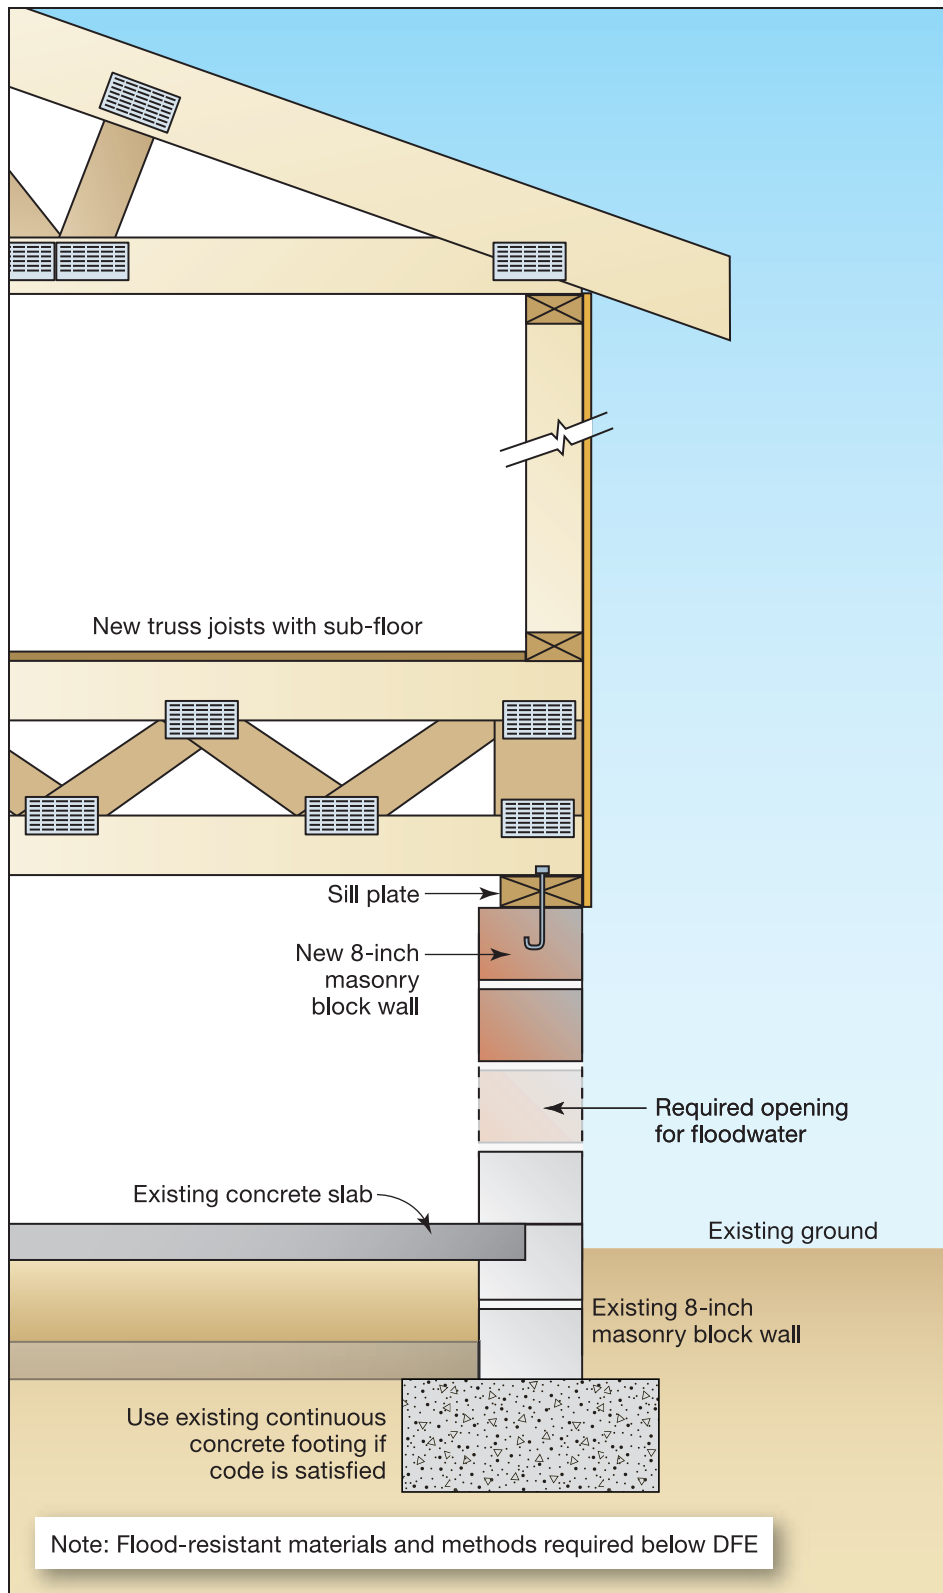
E-20. Cross-section of elevated wood-frame house (slab not raised) with extended stem-wall foundation and newly installed wood truss floor
